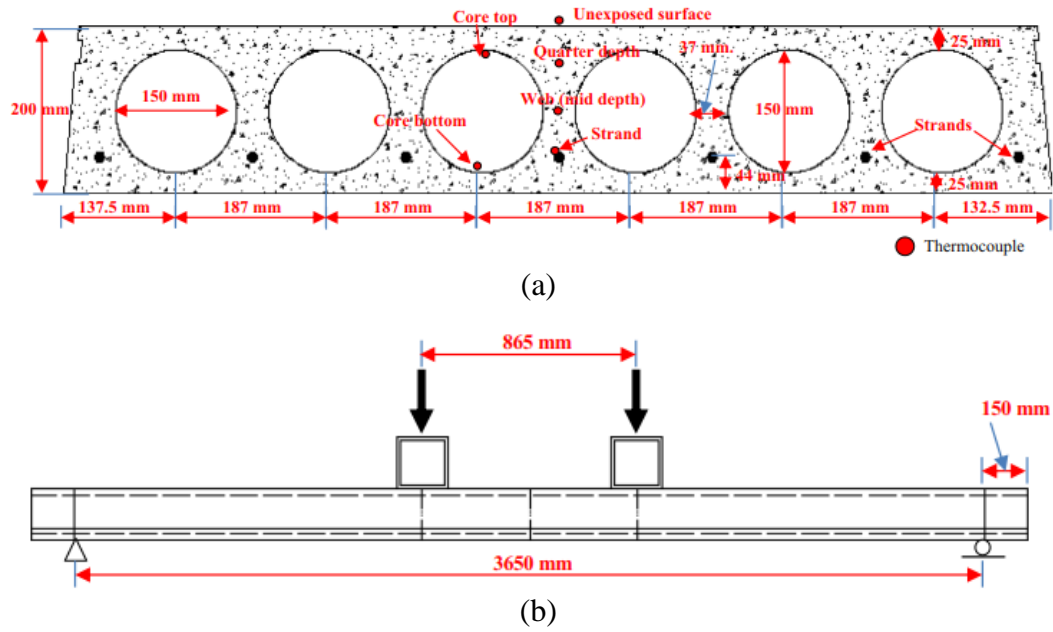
(a) Layout and cross-sectional details of slab 1 and slab 2, and (b) four-point loading scheme for fire resistance testing slab [13]
